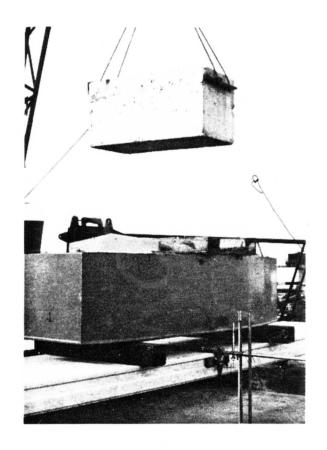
Test No. 1, Plank With Preload and Drop Weight in Position.
